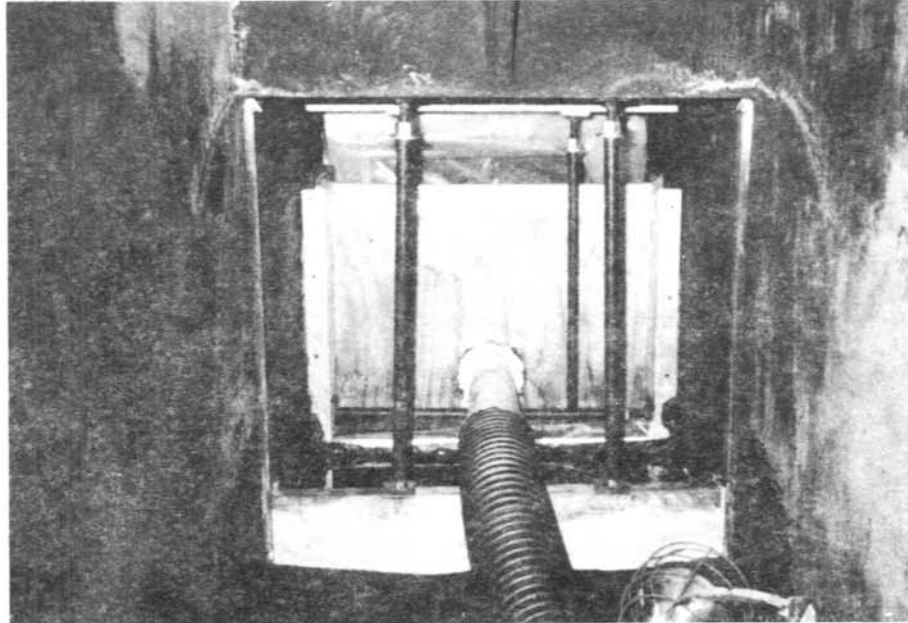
Lemon Dam - Cavitation repair - Bulkhead installed in right outlet conduit between the regulating and emergency gates to control all leakage during repair work. 4/24/88
